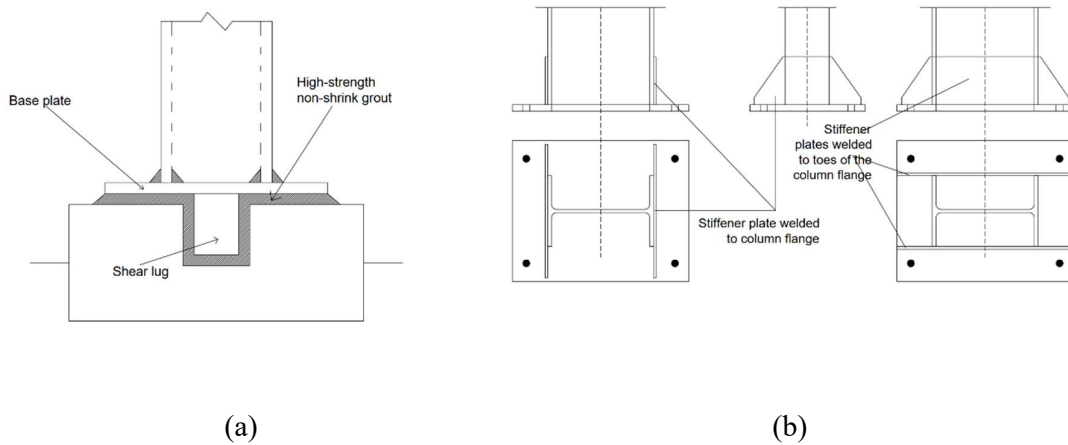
(a) Column baseplate with shear lug and (b) Column base plate with stiffeners
